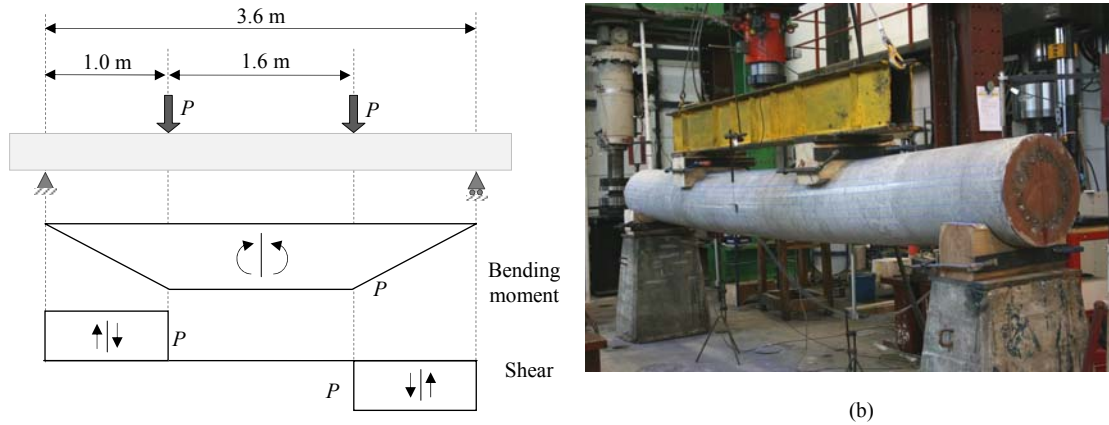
4 – point bending tests in RC piles: (a) experiment disposition; (b) specimen being tested
